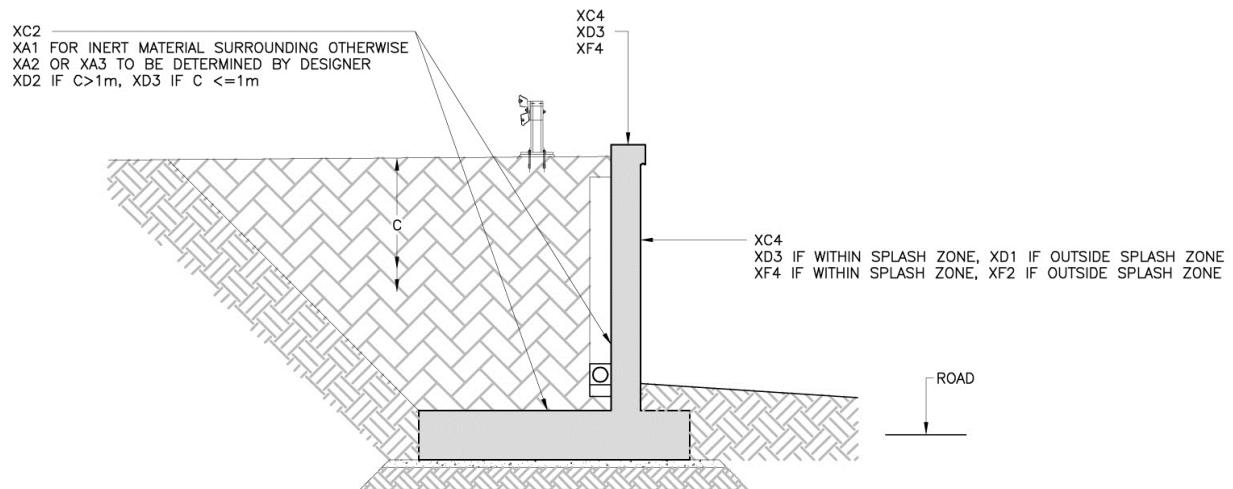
Wingwall / Retaining Wall (Road Over and Adjacent)
